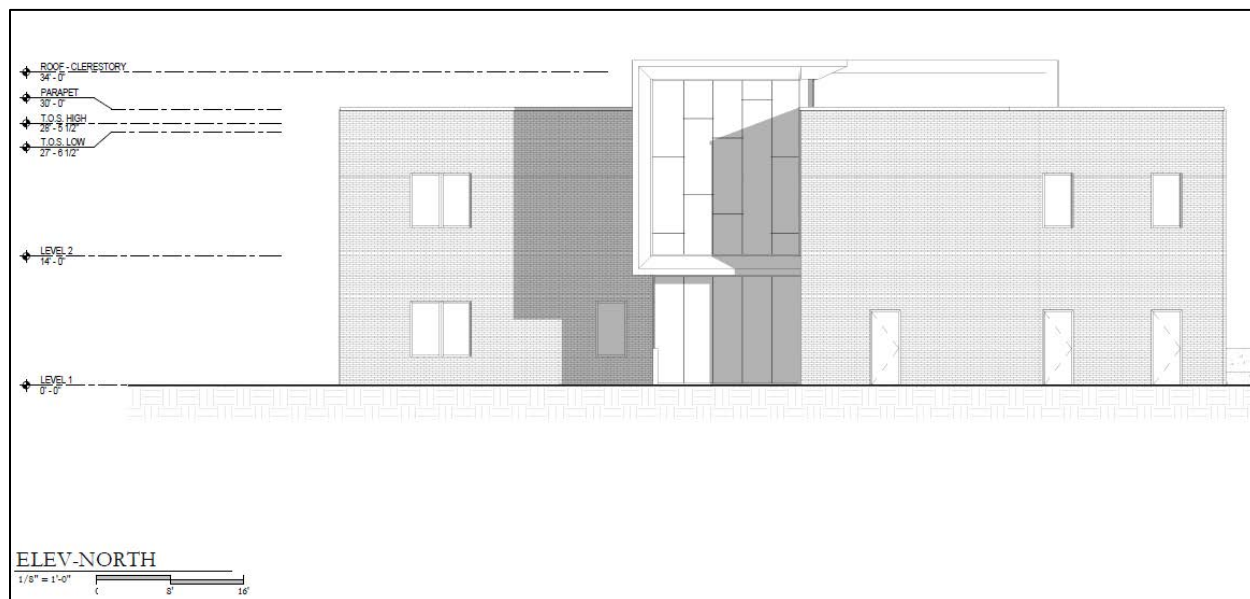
Depiction of the proposed north elevation showing that the lowest level of the structure would be constructed at Level 1 at 0 feet with no evidence of structure elevation. (Image Source: City Of New Orleans NOPD 4th District Station, 95% Design Development Submittal, Holly & Smith Architects.)
